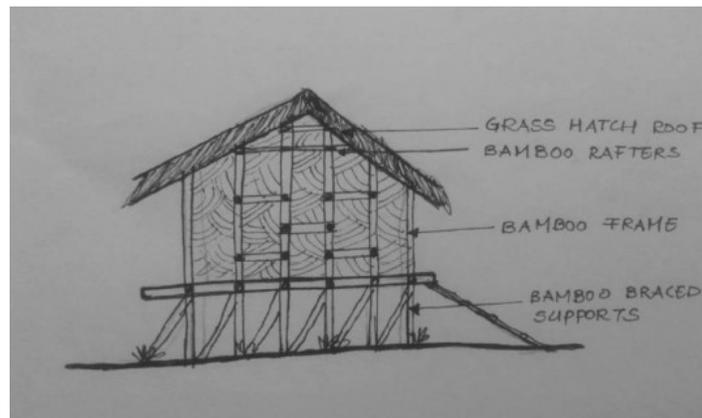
Illustration of typical Assamese house, using prefabricated wall panels
